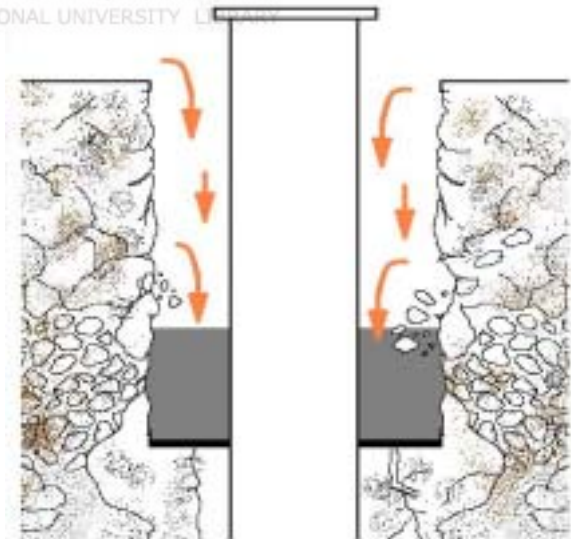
Falling rock state of that fill grouting city sill fractured zone section
